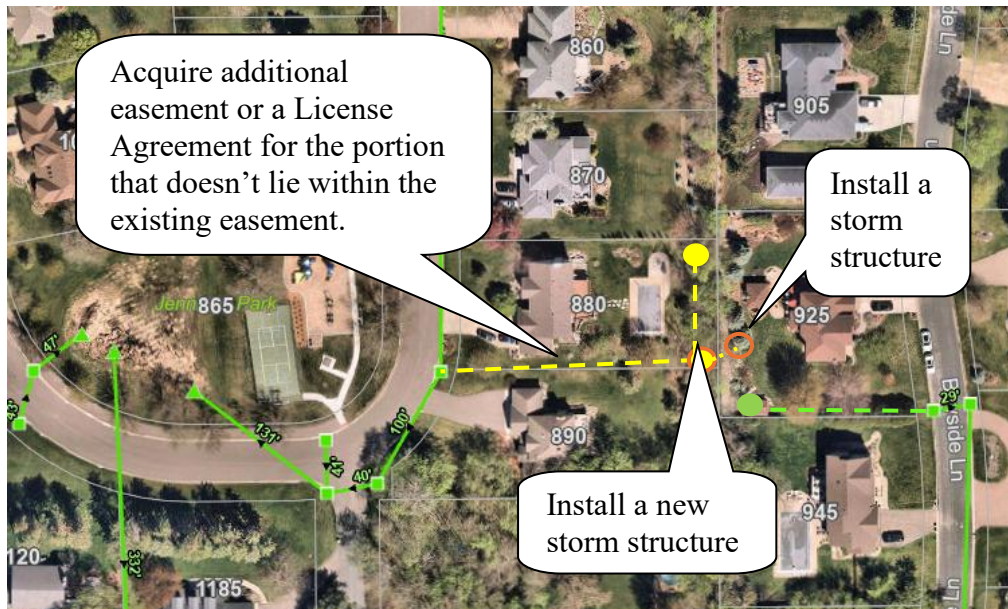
Proposed work to alleviate drainage issues on the west side of Bayside Lane
